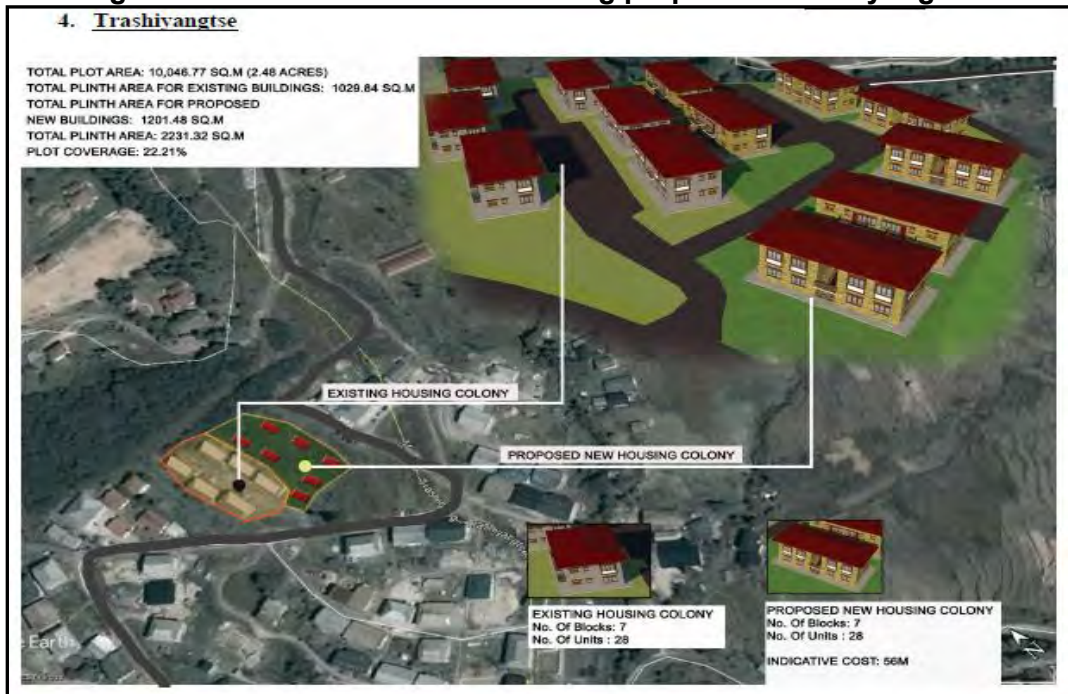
Site Location & new housing proposal in Tashiyangtse¹¹
